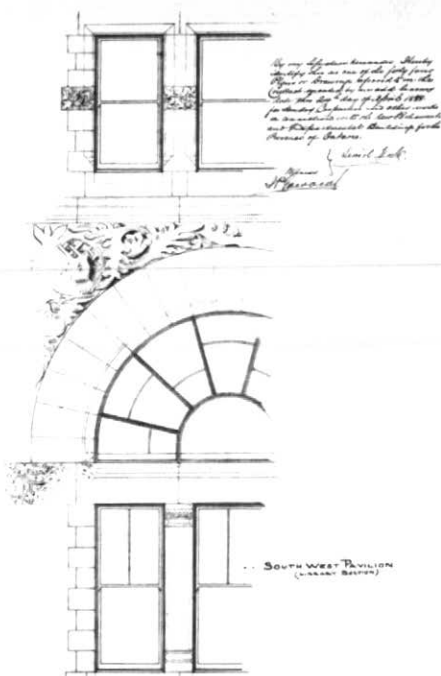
Part of Waite’s exterior elevation for the Parliament Building showing the style and concept of stonework to be performed (Archives of Ontario, RG15-13-2-130, Sheet 11-1-G-12).
